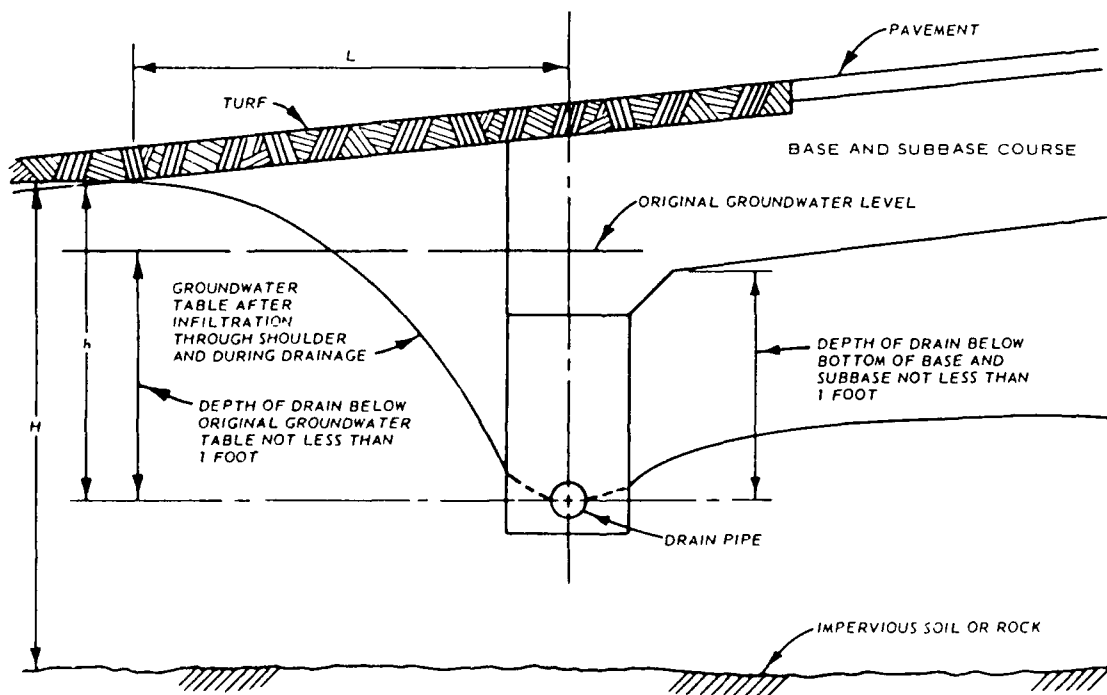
Groundwater conditions after installation of subdrains (from U.S. Army 1979).
